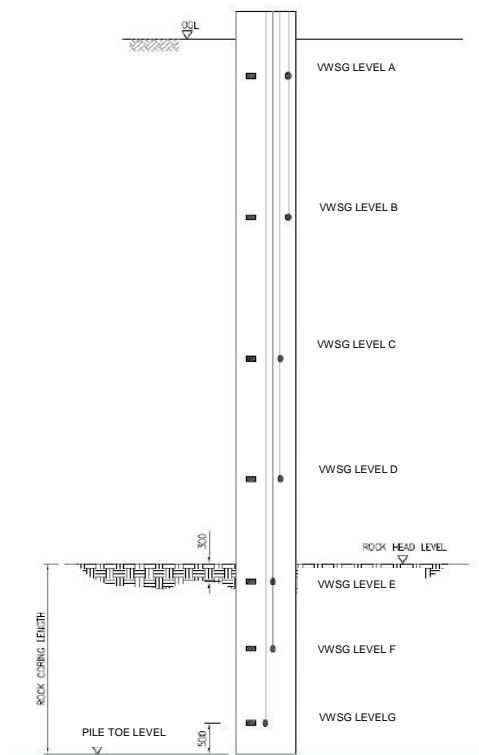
Typical Arrangement of Instruments for Pile Load Test
